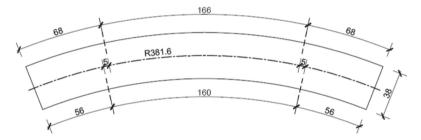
Top view of the printed specimens, fabricated to investigate two reinforcement alternatives above a window opening (dimensions in [cm])
